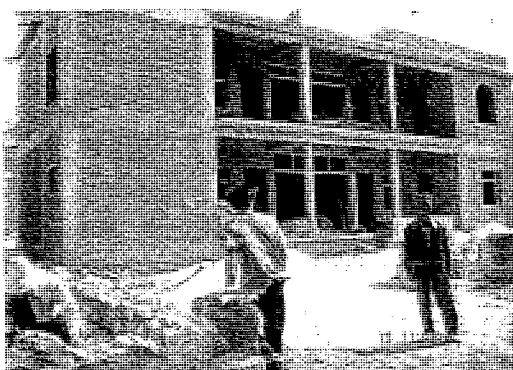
Migrant Li Zhicheng is building his new house, taken at Damaoping Village, Shangguan Town, Dali City
